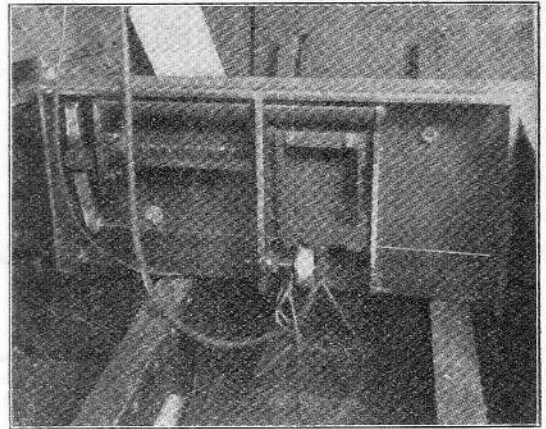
Sagging and Hogging Tests. Details of One of Four Extensometers rigged on Longitudinal and Deck Girders.
